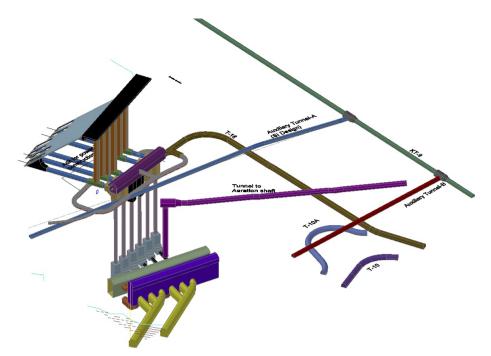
3D model of underground powerhouse cavern and connection tunnels.
